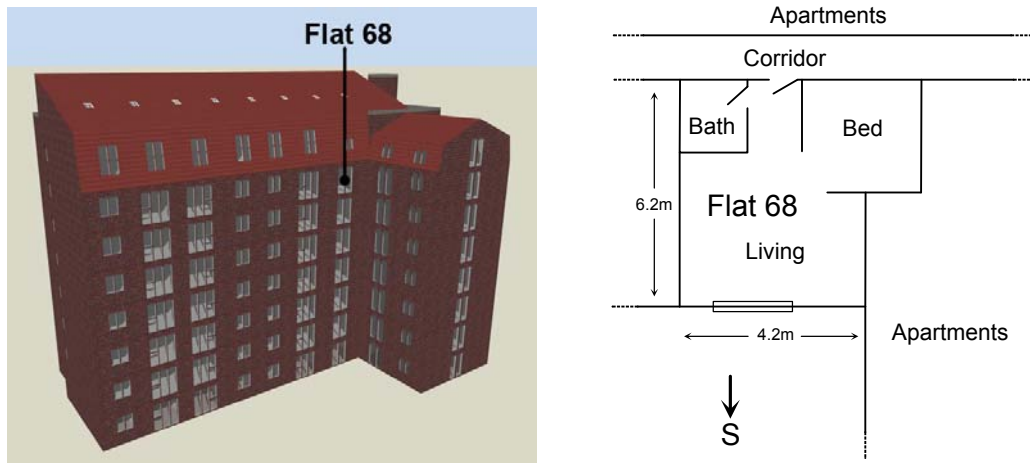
Queen St. apartment building simulation model and Flat 68 floor plan
